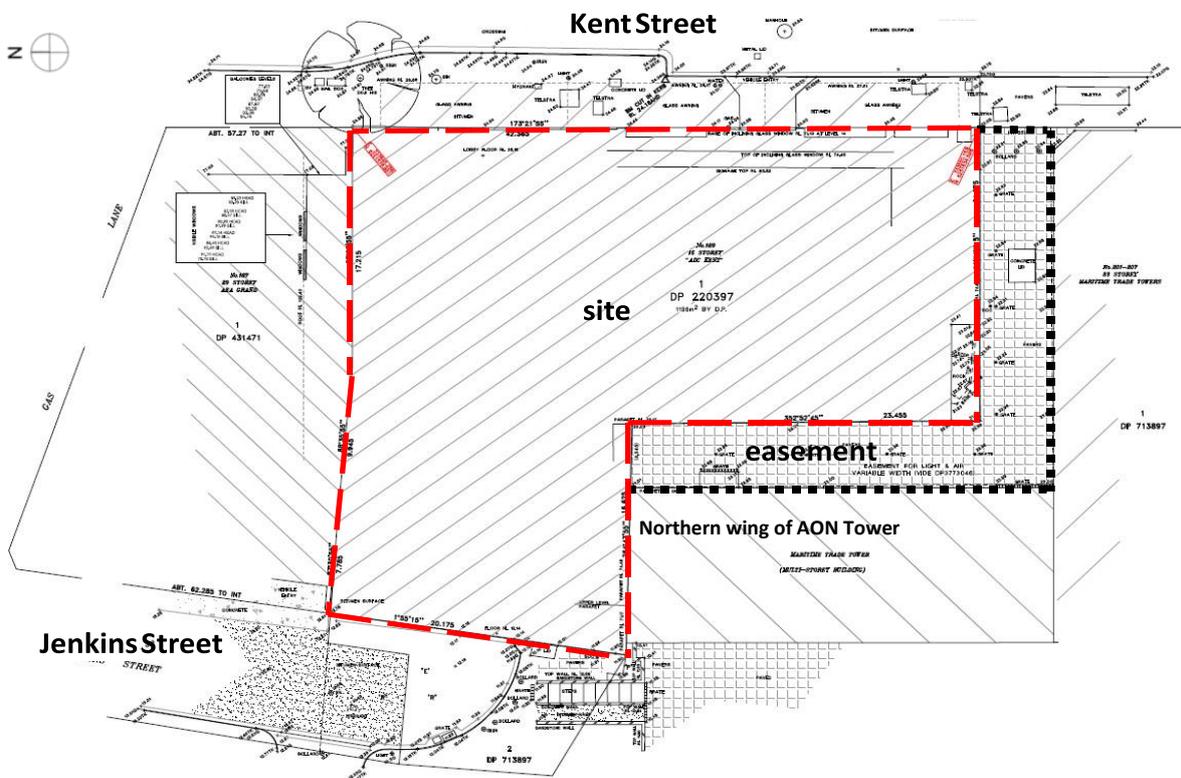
Survey plan extract showing location of easement along the south and south-west site boundaries.
